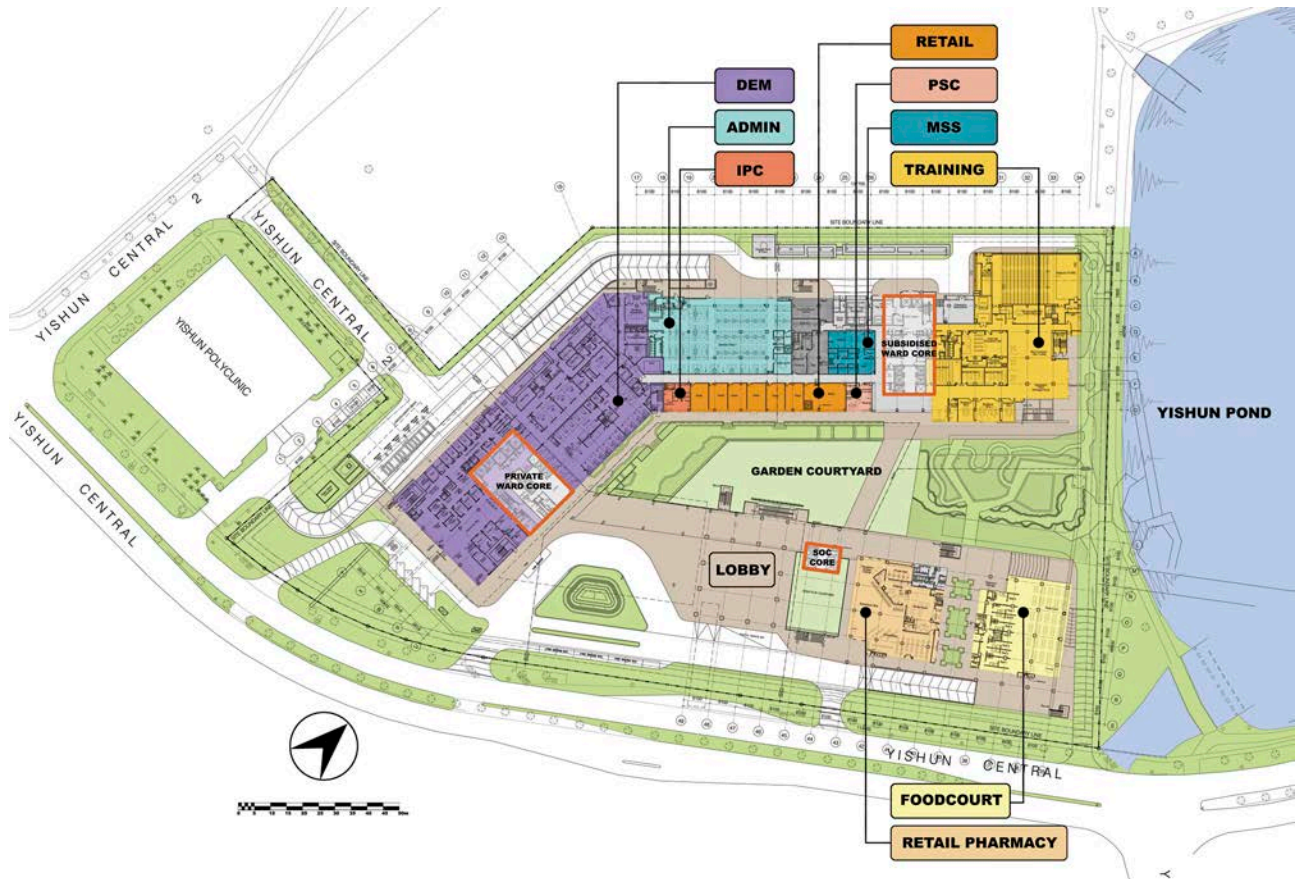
First floor plan. Source: CPG Consultants Pte Ltd.
